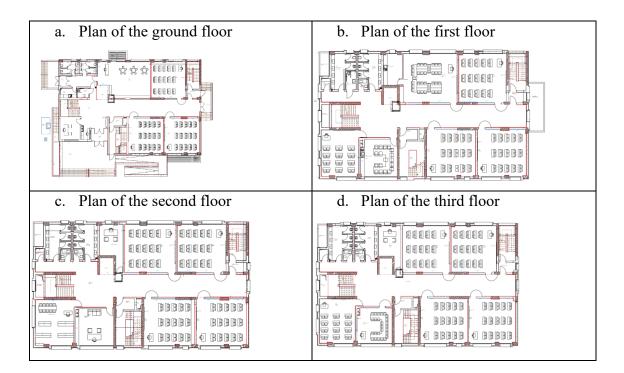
Plan of the Asil Nadir Primary School, ground floor (a), first floor (b), second floor (c), and third floor (d).
